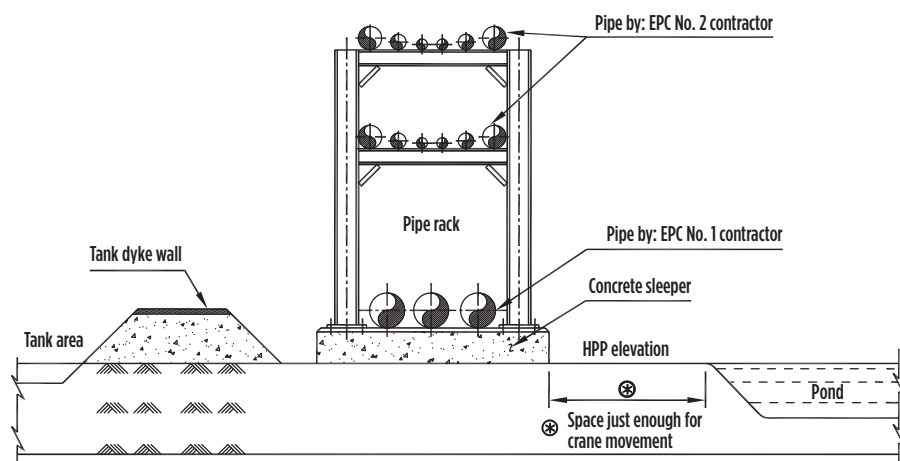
To allow two contractors to carry out piping work between a tank dike wall and a pond, with little space for vehicular/crane movement, a goal post-type frame was mounted on concrete sleepers.
